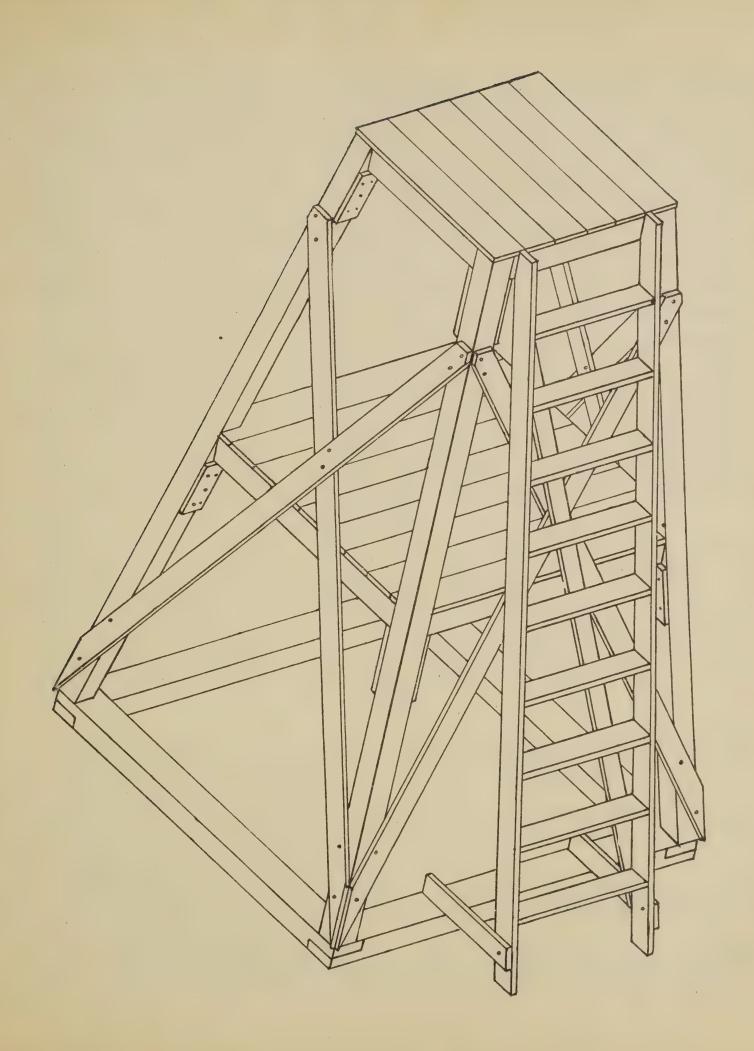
WORKING DRAWINGS FOR CONSTRUCTING AN EVAPORATION STAND.
